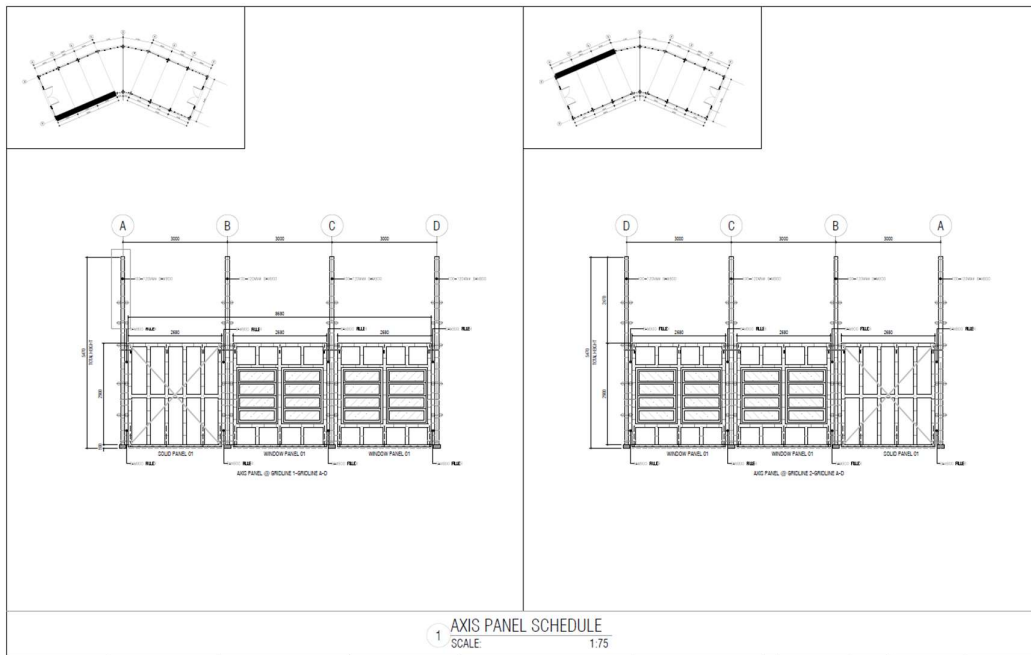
Composite bamboo shear walls of the case-study building: Kanya Kawayan weaving centre. Drawing not to scale. Drawings provided by Base-Bahay Foundation.
